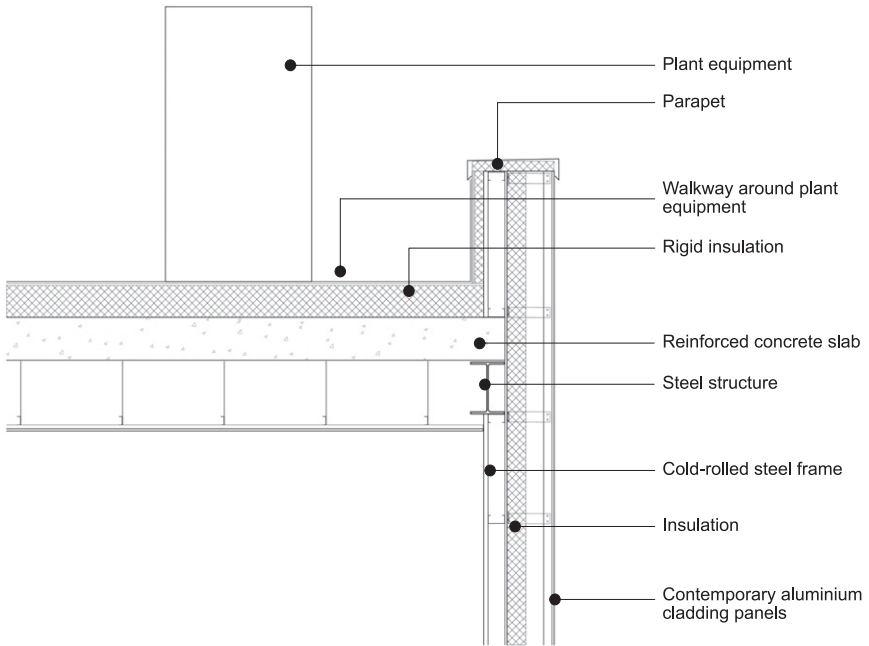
Simple section of the roof and wall design. (Source: Author.)
